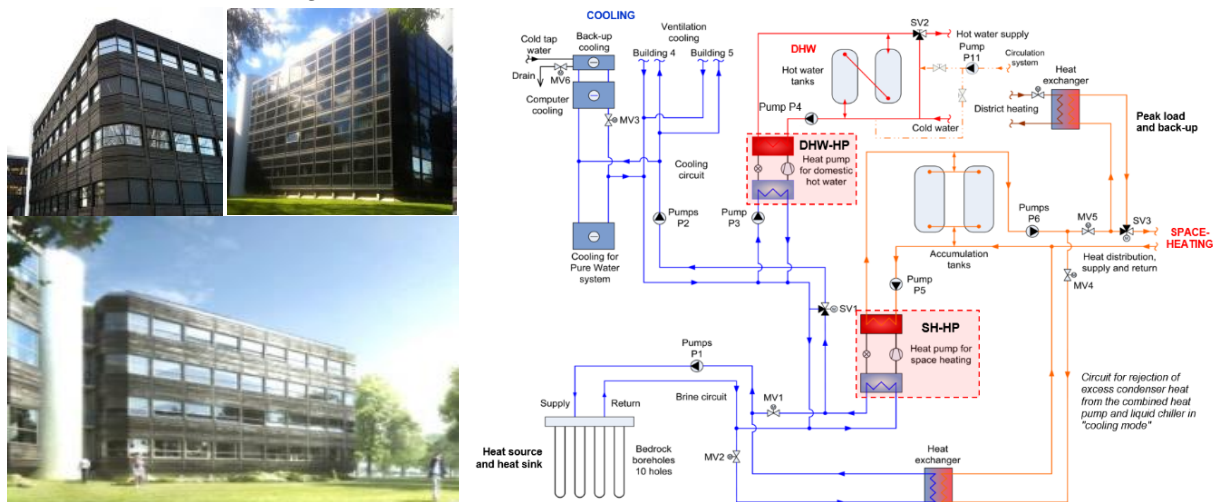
View of Powerhouse Kjørbo (left, source ZEB) and hydraulic scheme of the building (right, Nordang, 2014)
